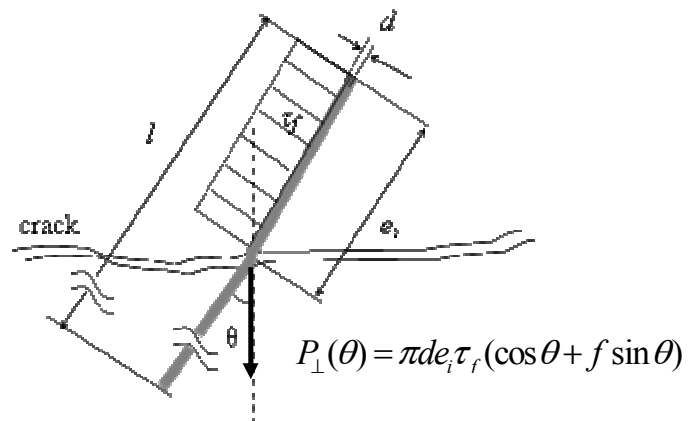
Steel fiber intersecting a crack in concrete transfers a load $P_{\perp}(\theta)$ perpendicular to the crack plane.
